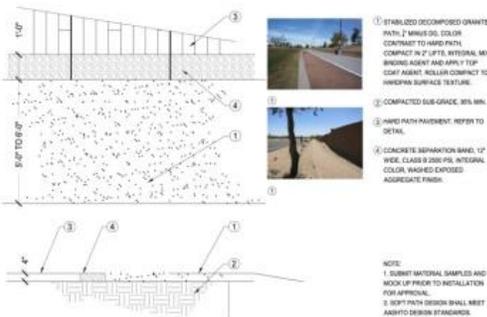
Recommended Path/Trail Section, Provided by the Tempe Multi-Use Path System Detailed Plan.
